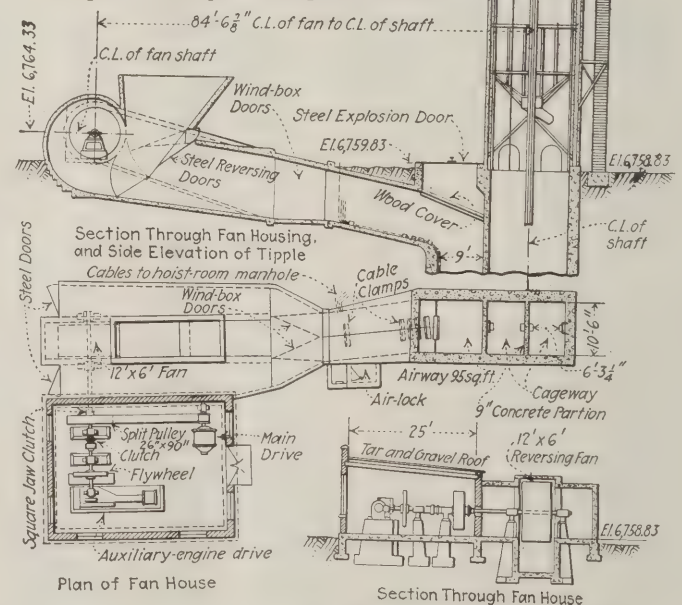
MATERIAL HEADFRAME WITH SECTIONS THROUGH FAN HOUSE
